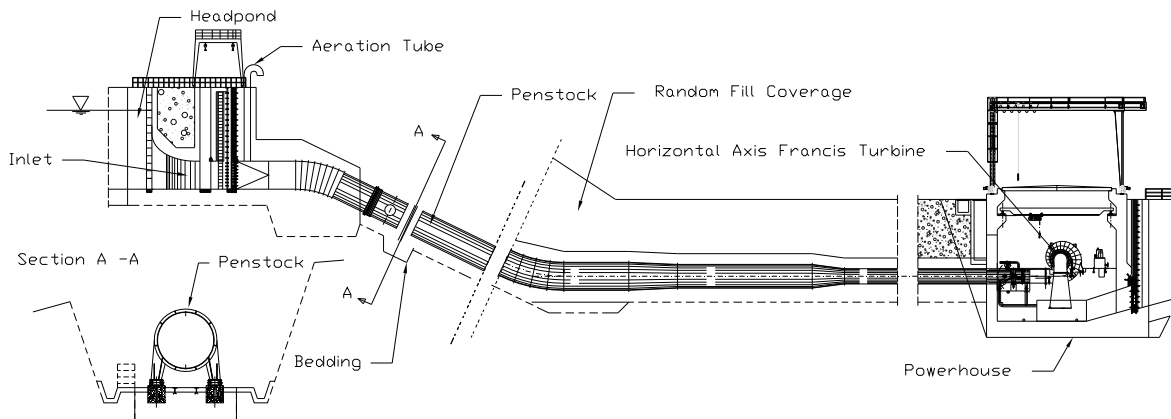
Typical section of head pond, penstock and powerhouse at feasibility stage (taken from a medium HEPP project in development)
